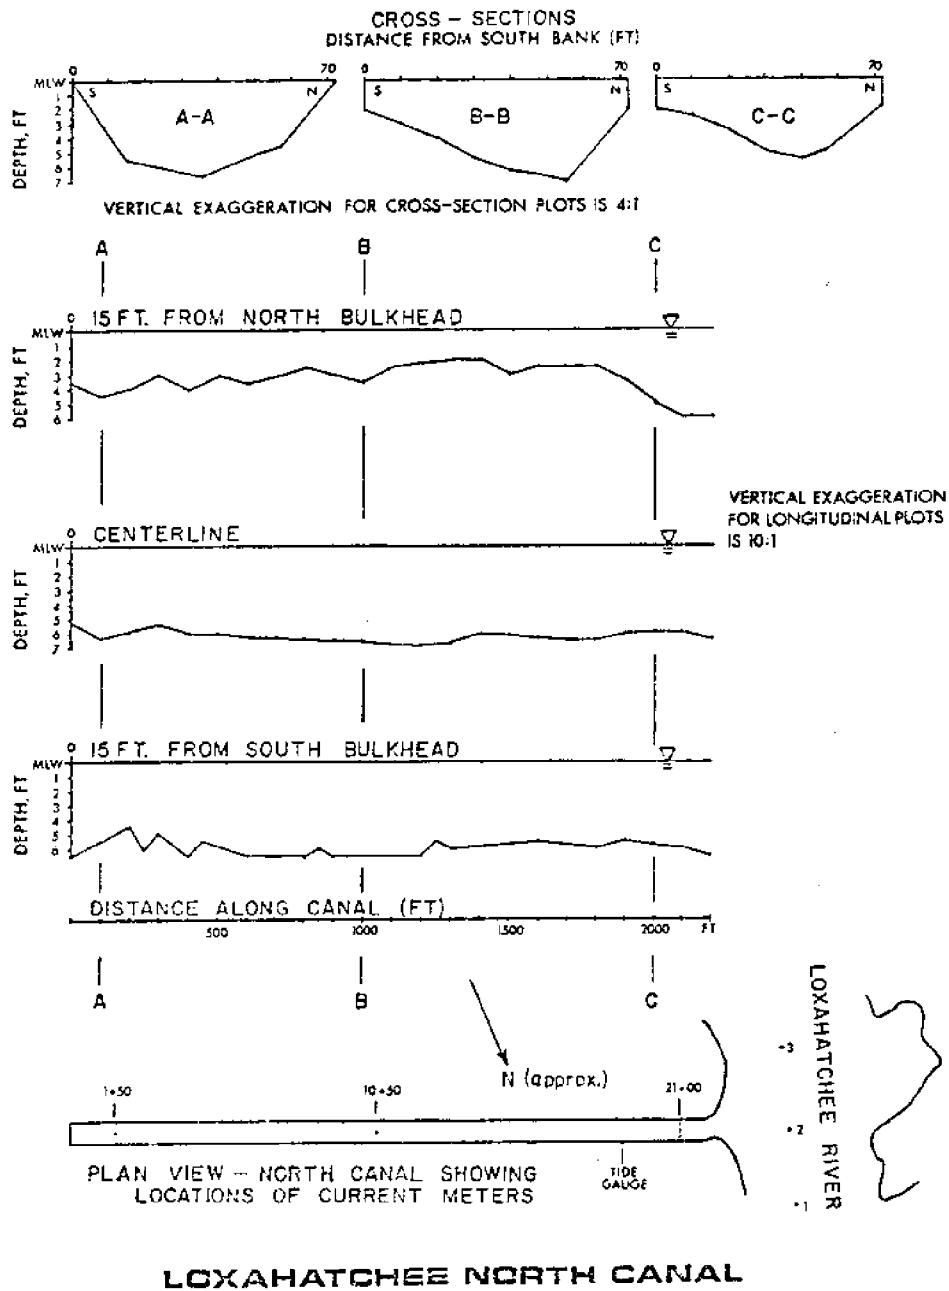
Cross-Sections and Plan View of Loxahatchee North Canal, June 1977.
